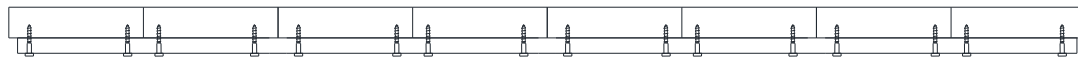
Cross-Section of Glulam Timber Slab Bridges
